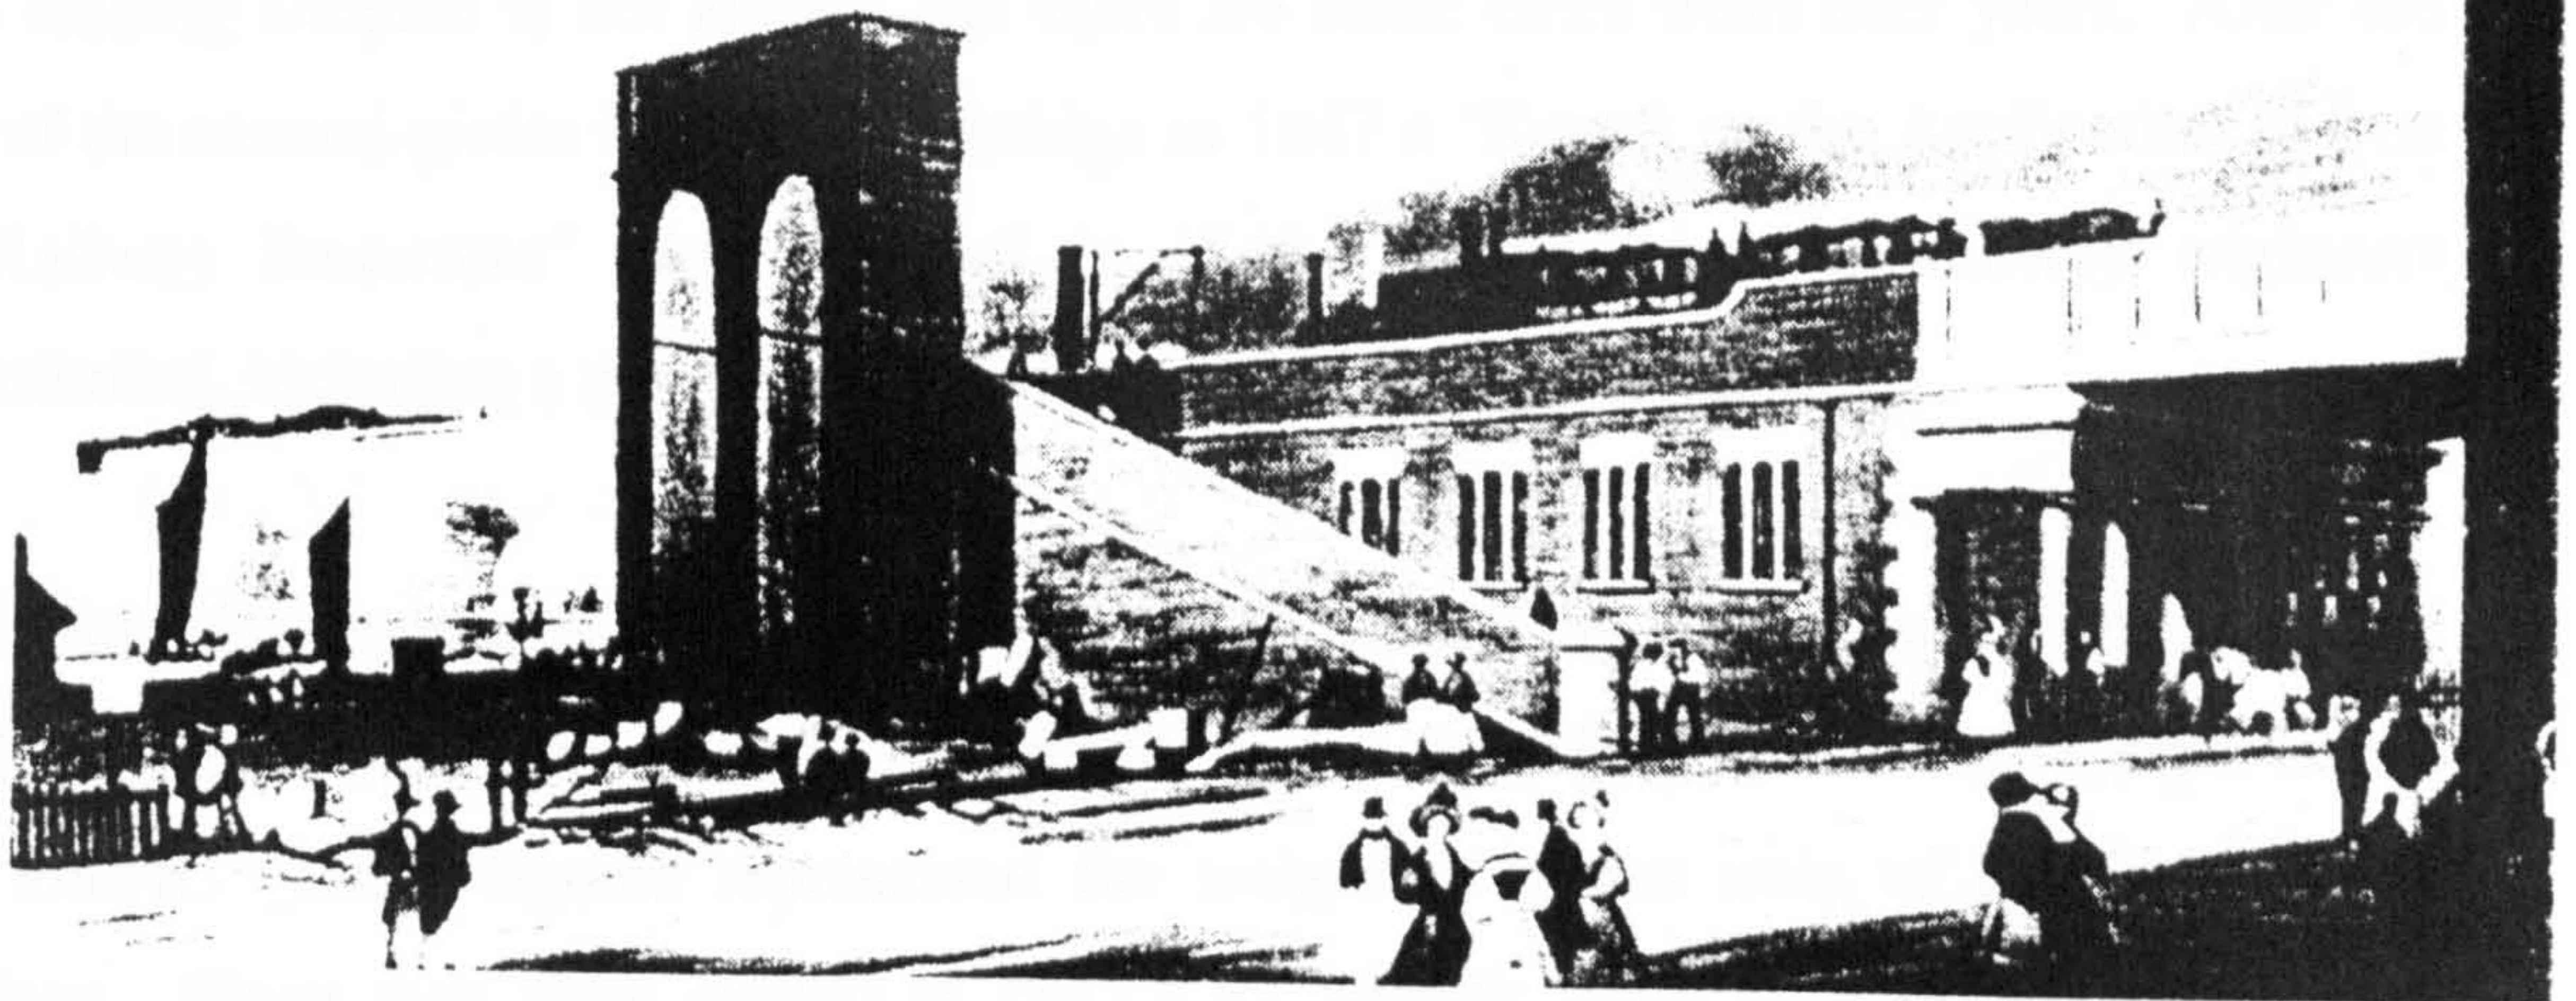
Water Street bridge of 1830 on extreme right (Beckett, 1984)
